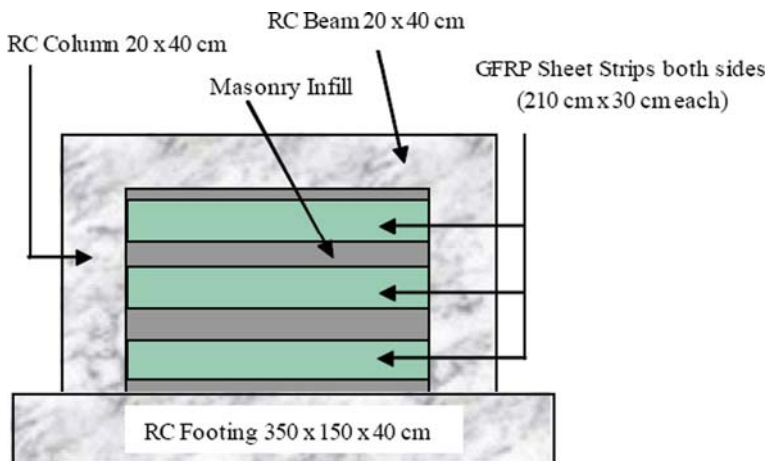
GFRP strips applied to masonry infill wall (See also Plate 9 in Color Plate Section on page 460)
